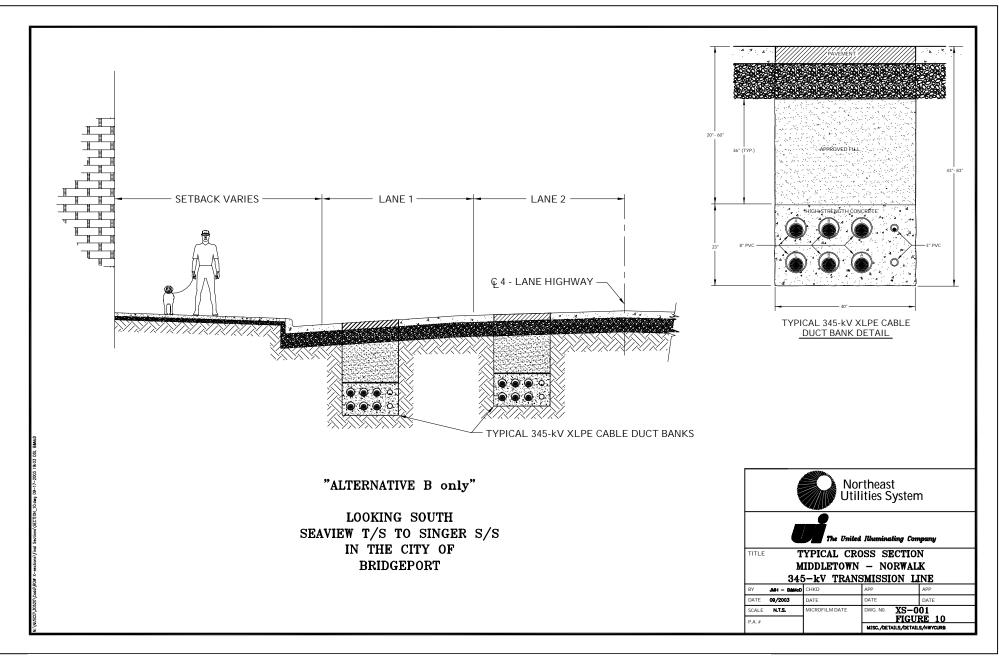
Cross section 10 - Underground from Seaview Transfer Station to Singer Substation (Bridgeport) (No electric field above ground)
